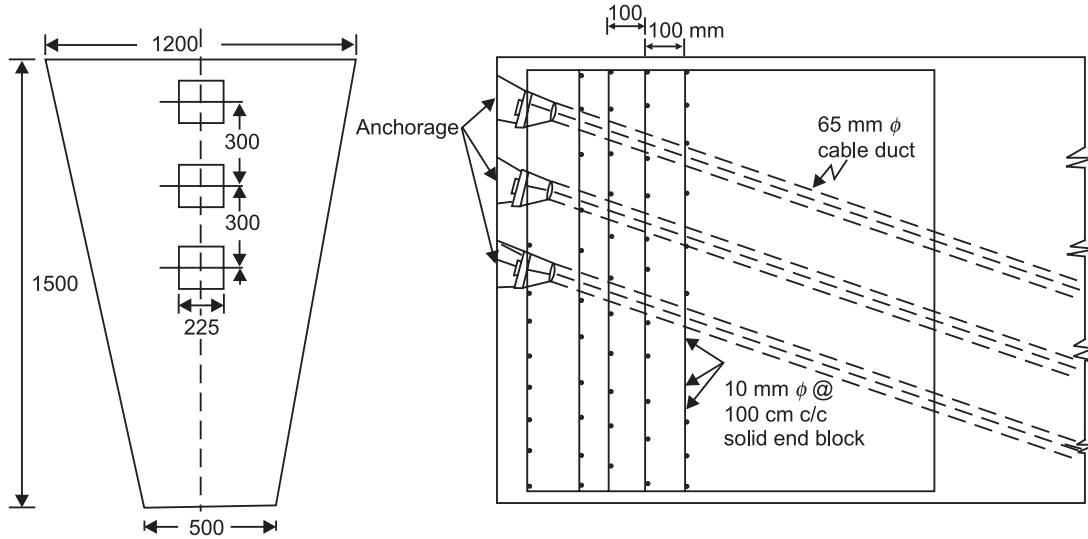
Equivalent prisms and anchorage zone reinforcement.
